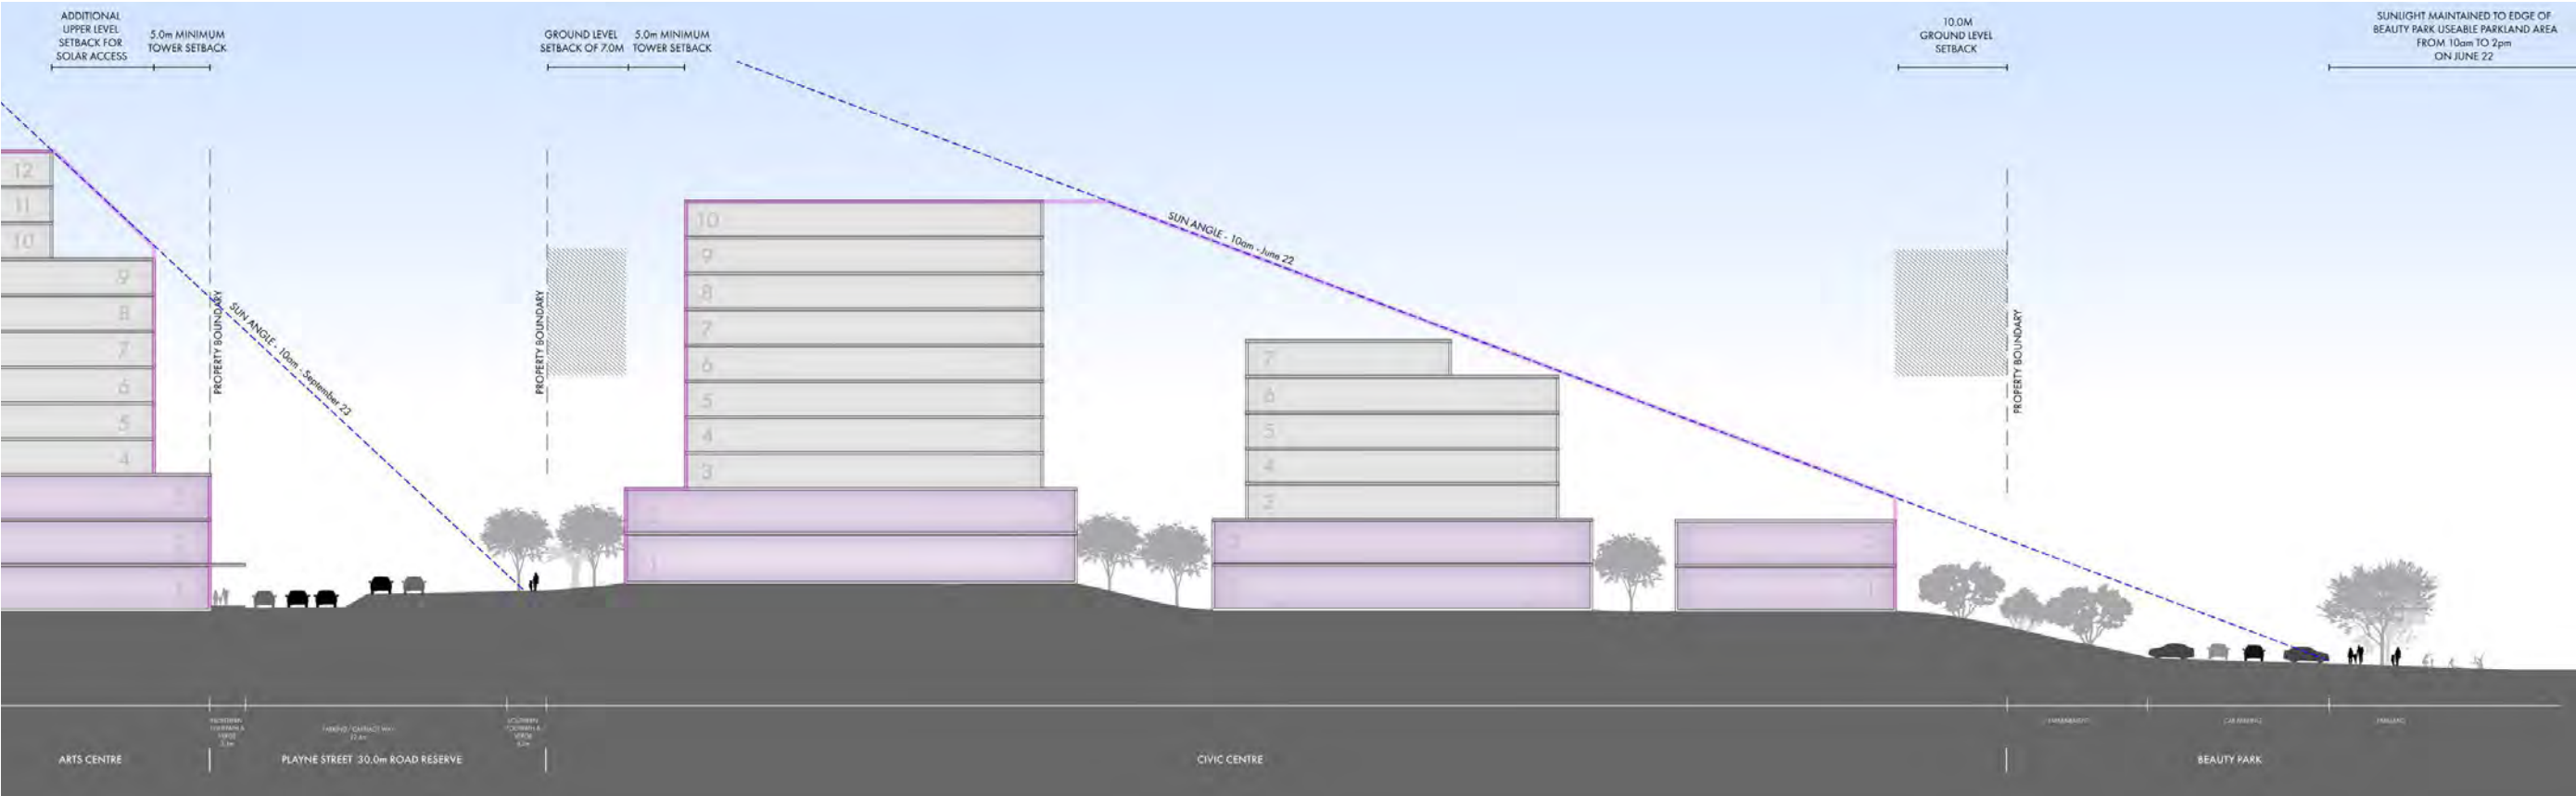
Davey Street, Civic Centre and Beauty Park - Proposed building heights and sun angle
